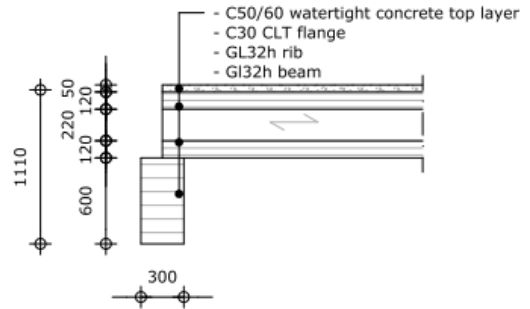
Floor design 3 glulam beam detail cross-section C-C minimum height in mm
